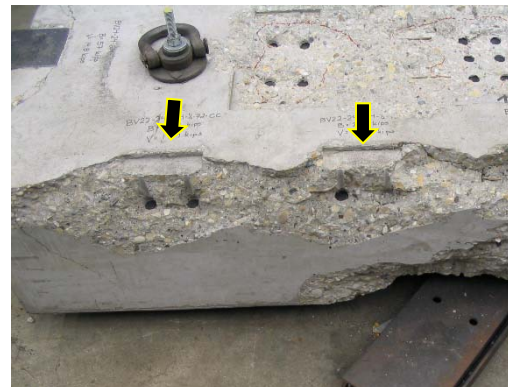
Overall view of two shear tests with a $0.2f'_c$ bearing stress.
